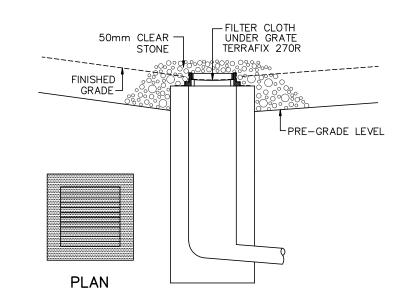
## DETAIL FOR STREET CB SILT PROTECTION SCALE: NTS
